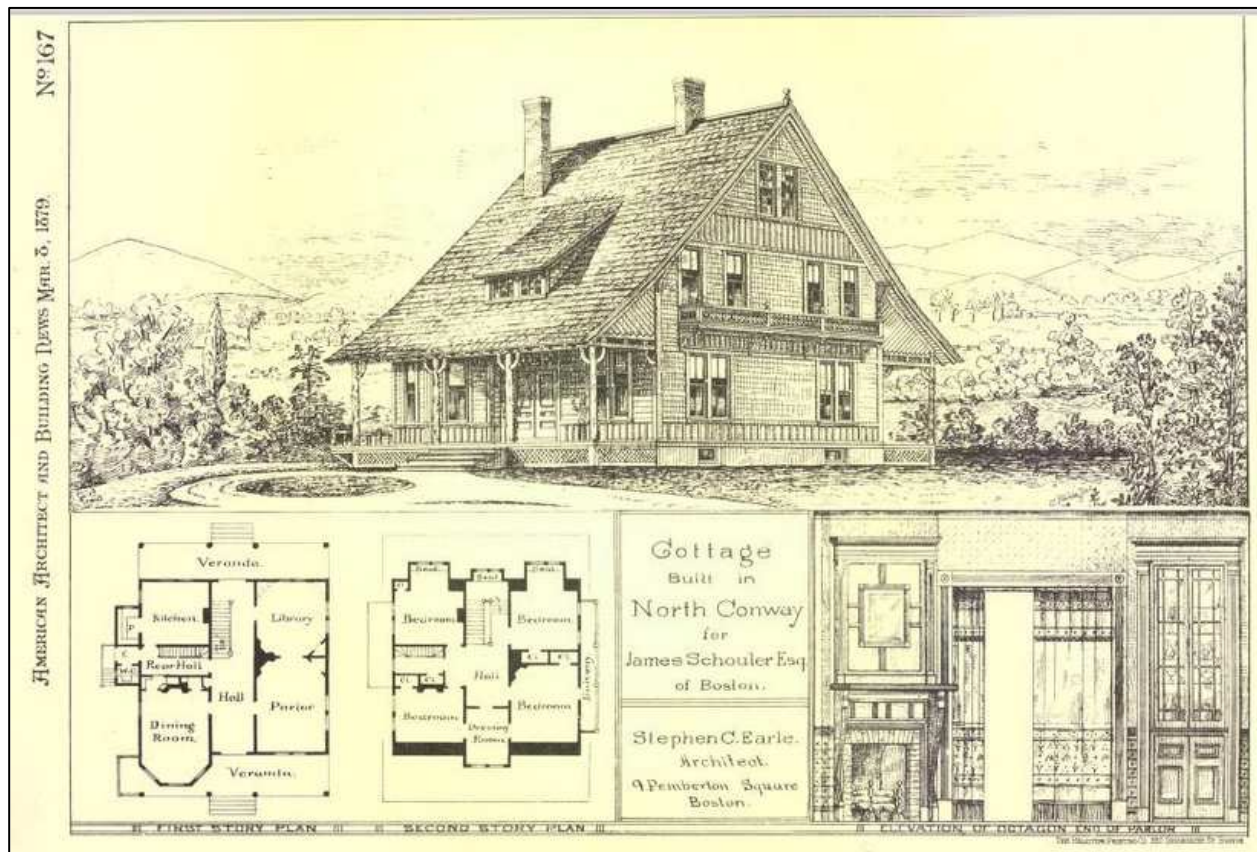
Kilbarchan (American Architect and Building News, Boston: Houghton, Osgood & Co, March 8, 1879, plate No. 167)
